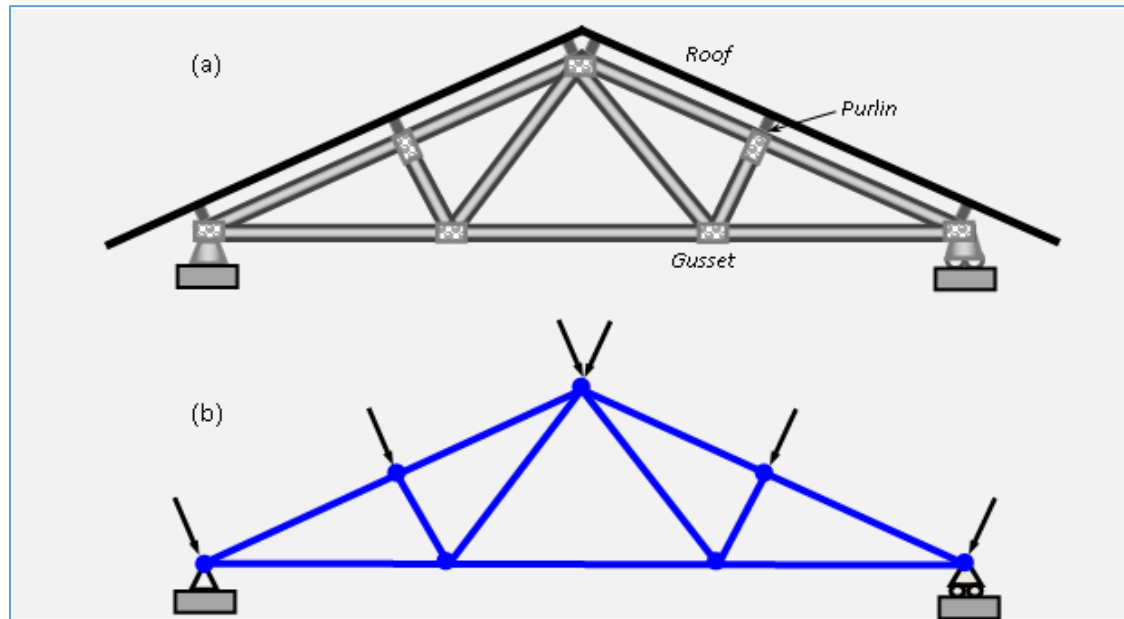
Modeling of a planar roof truss: (a) Physical structure (b) Discrete model.
